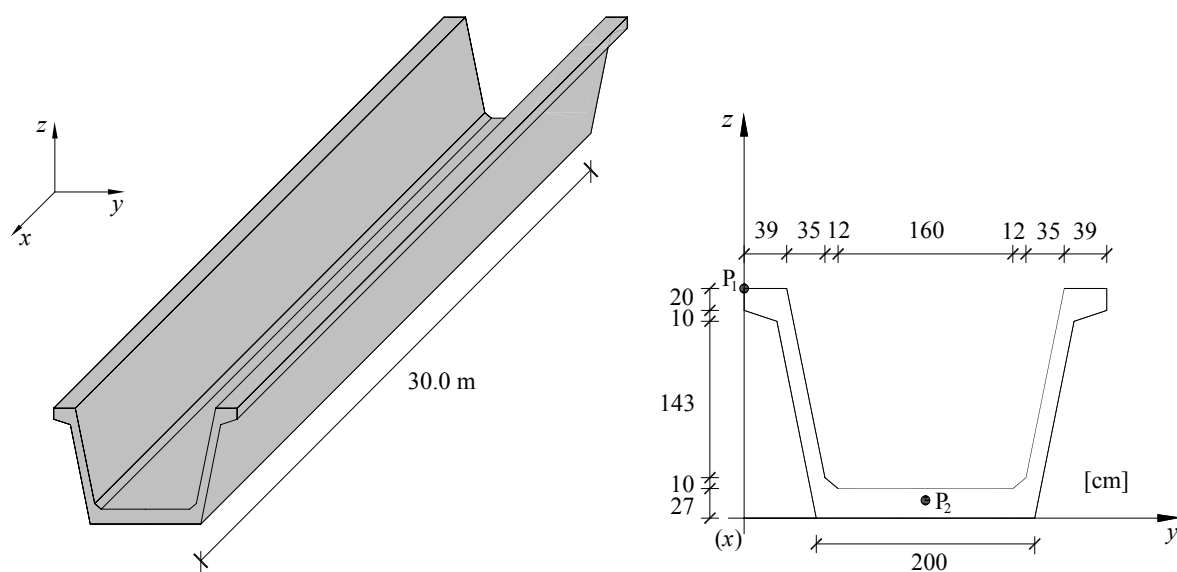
Geometry of the prefabricated reinforced concrete bridge beam with a U-shaped cross section.
